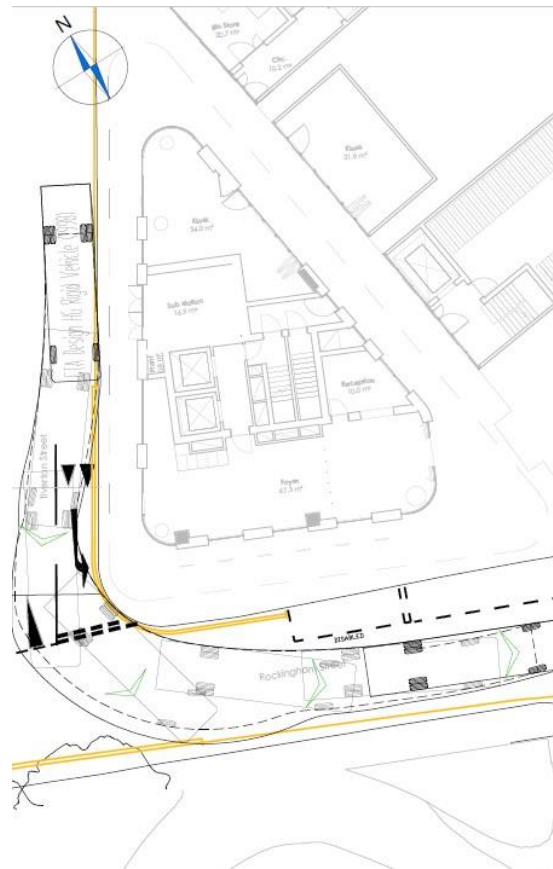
(above): Proposed highway arrangement at the junction of Tiverton and Rockingham Streets.
